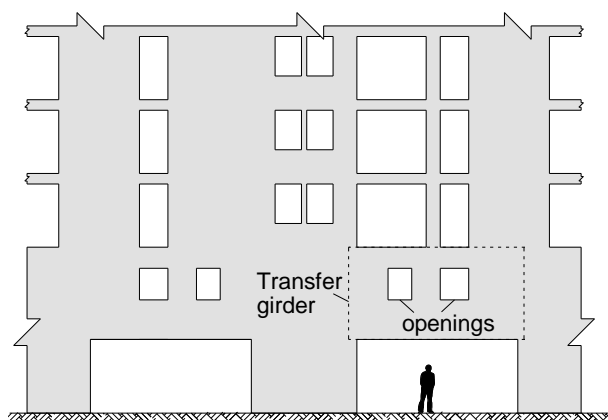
A 30-storey apartment having transfer girder with web openings
